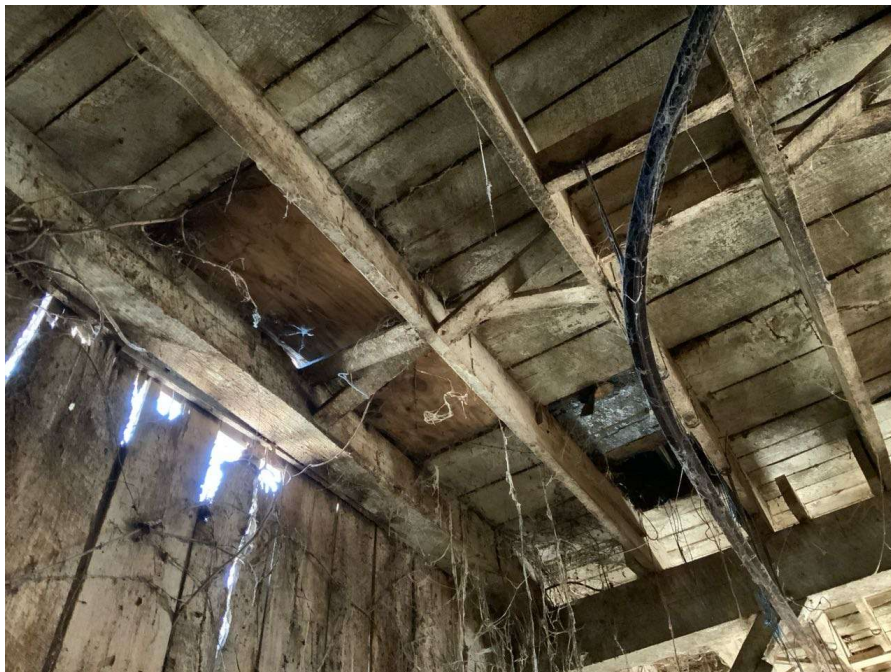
Typical rotting/broken/missing floorboards. Lean-on portion of structure near Gridline N shown looking southeast. Note plywood has been installed to cover some openings.
